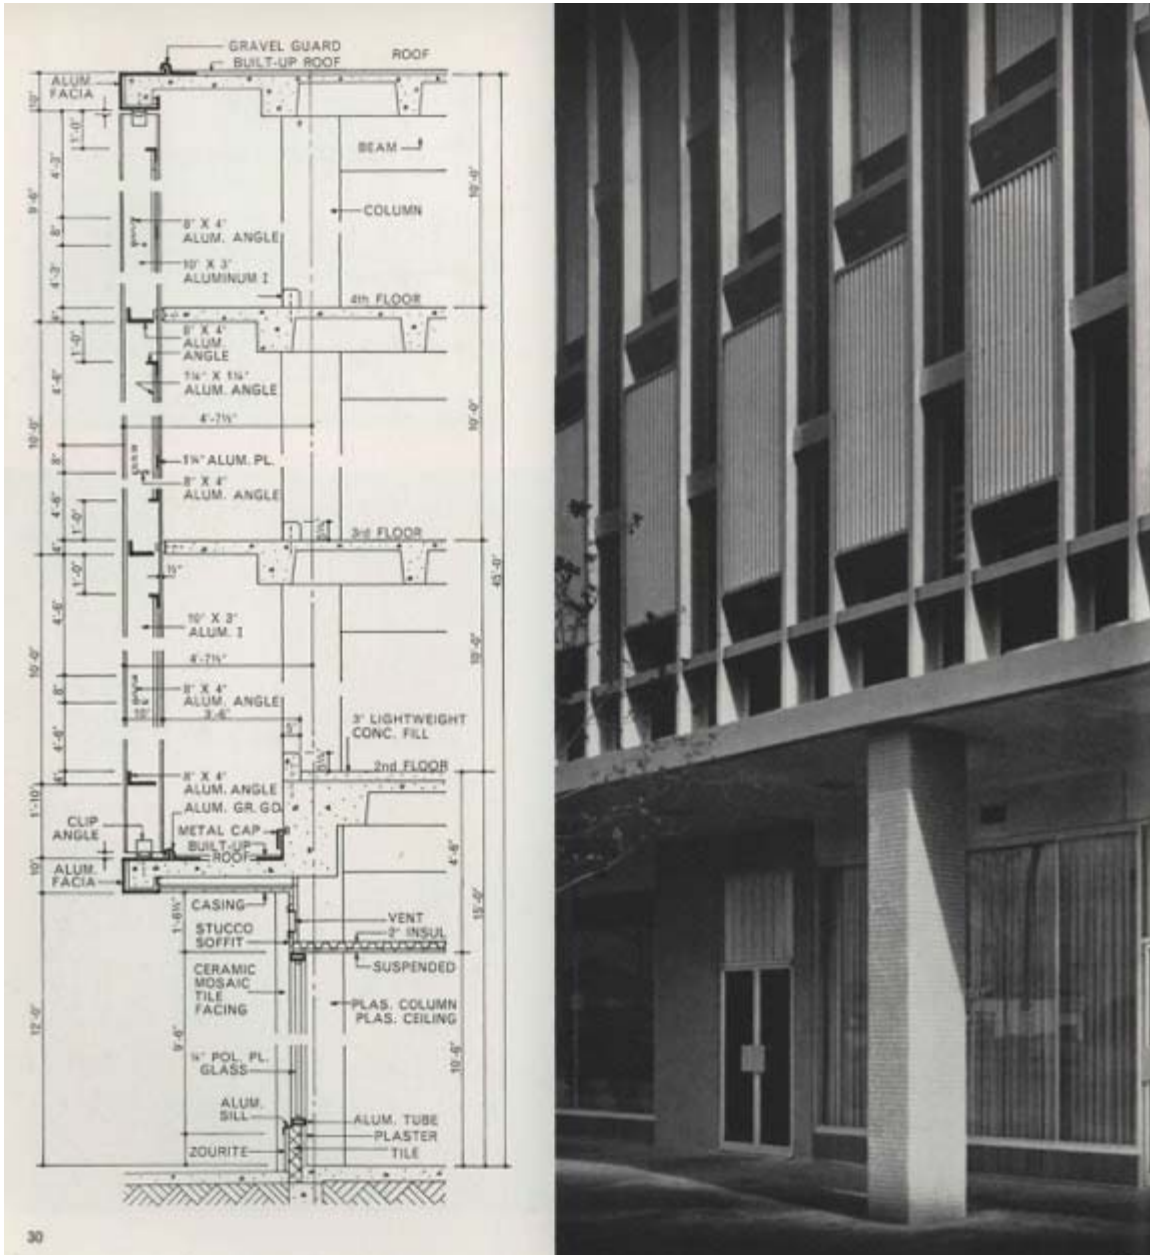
Medical Towers Lower Levels Section & Typical Storefront Photo
